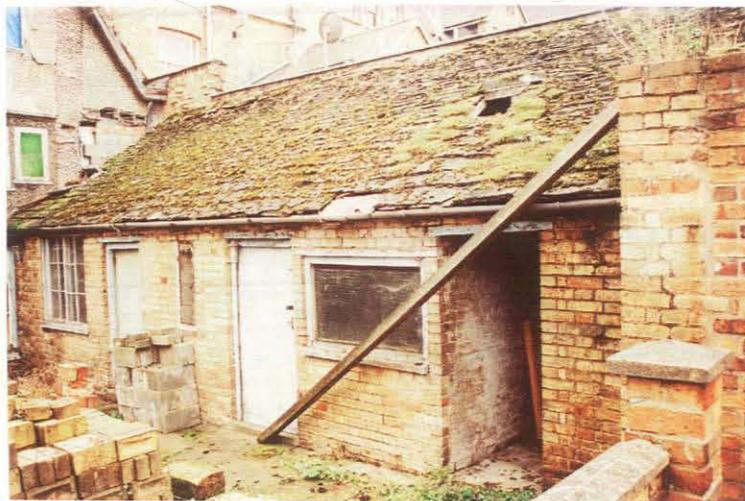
Outbuilding (Rooms 64/3 - 64/6) situated in Yard 64/7 at the rear of the property, looking southeast
